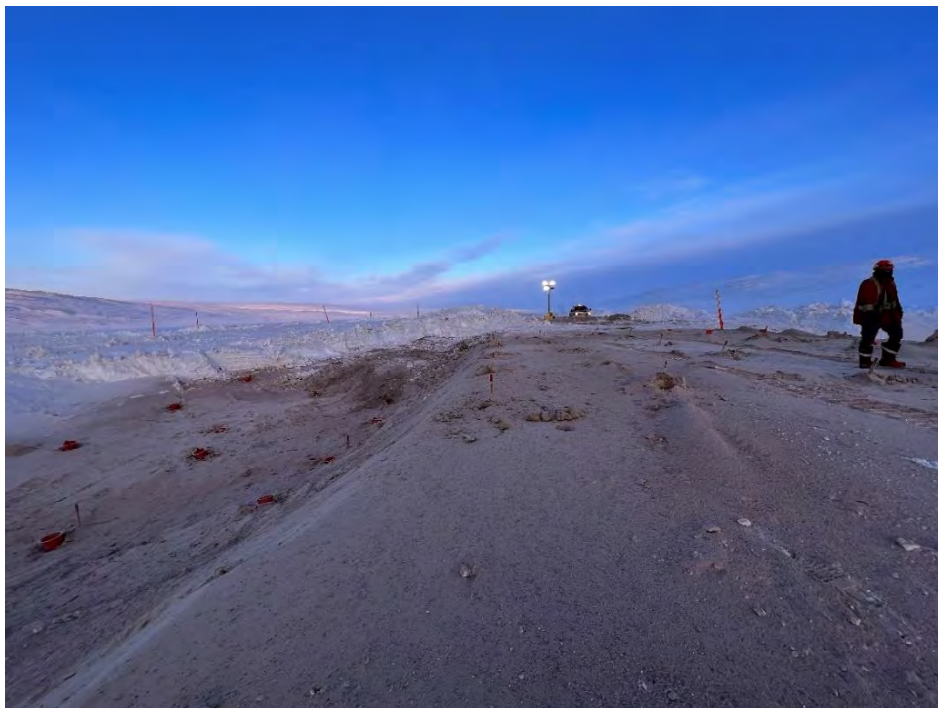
CV-059 drillholes facing North on the Tote Road (February 20, 2024)
